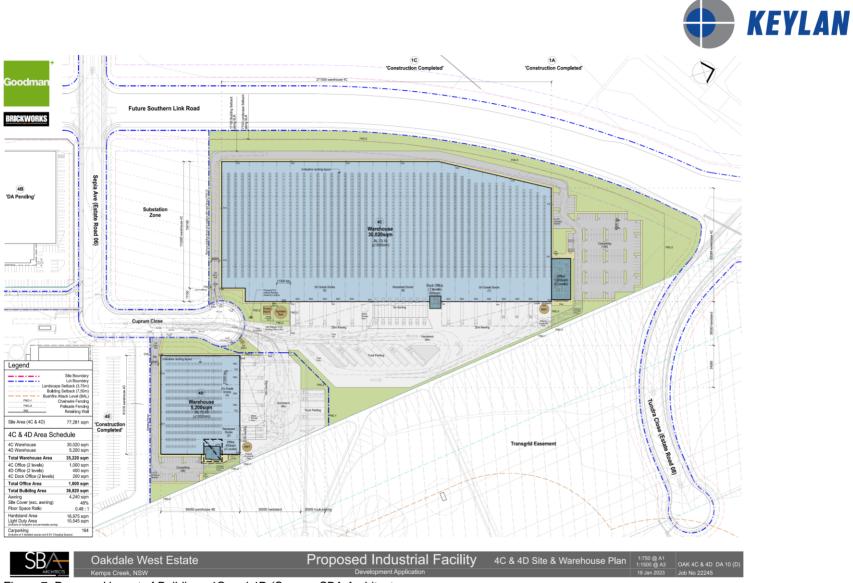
Proposed layout of Buildings 4C and 4D (Source: SBA Architects
